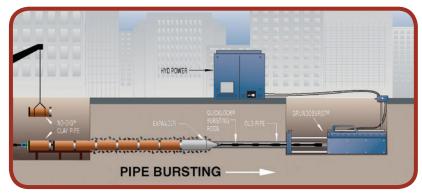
Static Pipe Bursting process of pulling in Jacking Pipe
